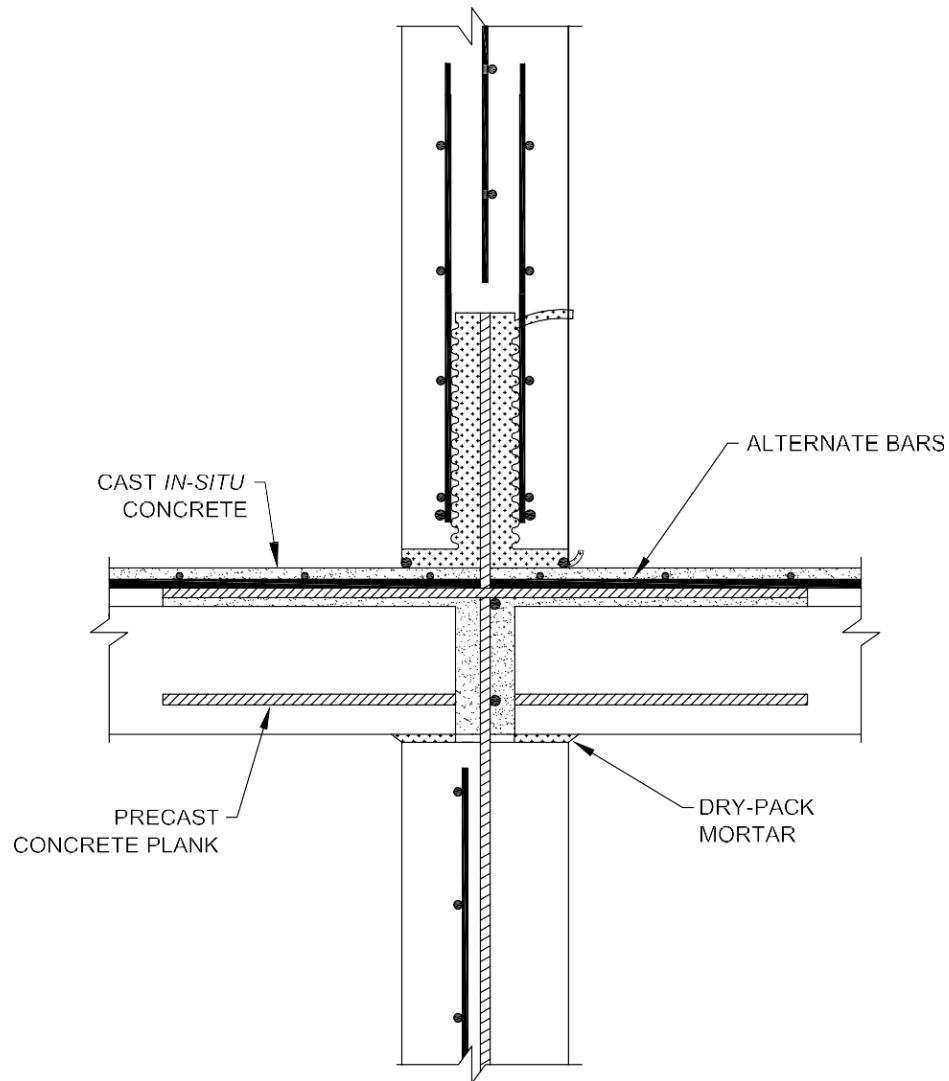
WALL TO FLOOR SLAB CONNECTION
